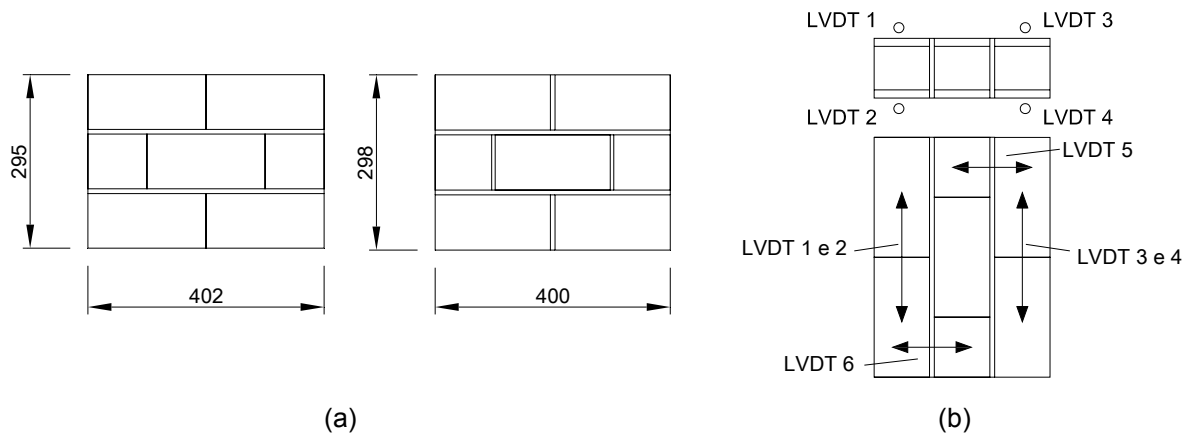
Specimens used in compressive tests in the direction parallel to bed joints: (a) geometry and (b) instrumentation.
